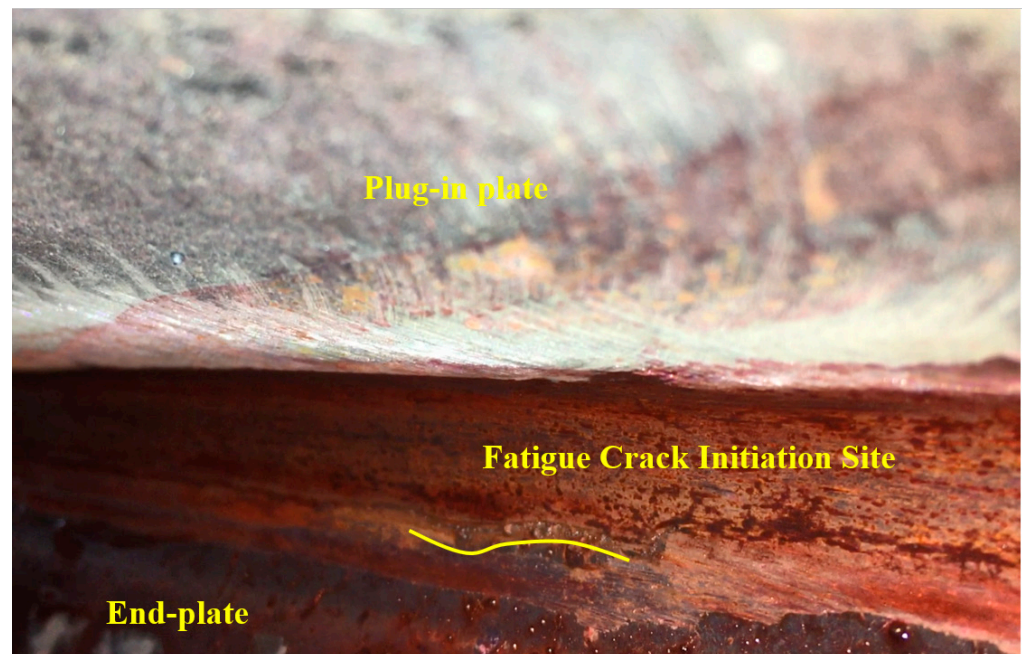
Cracks originated at the weld toe on the end plate.
